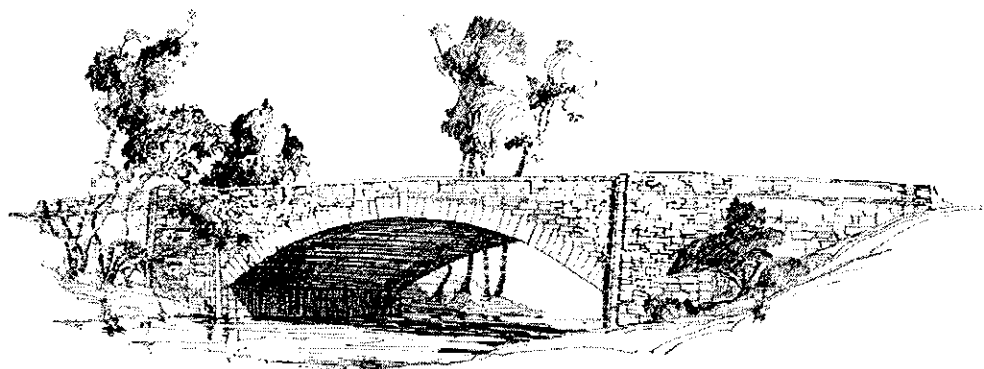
Architectural elevation of bridge over Boundary Channel
